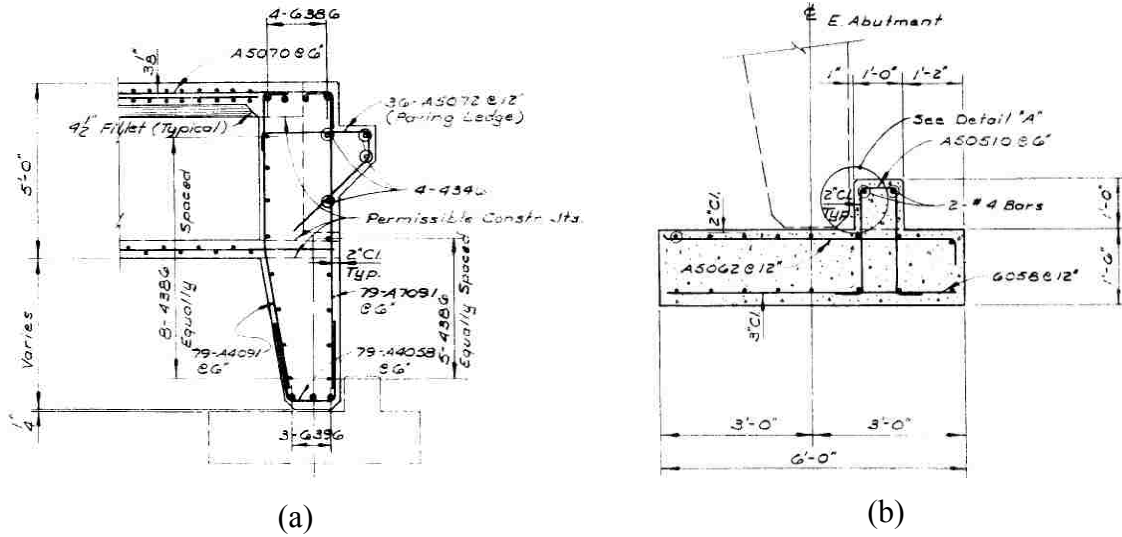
Bridge H-1211 - (a) End diaphragm section and (b) abutment footing section
